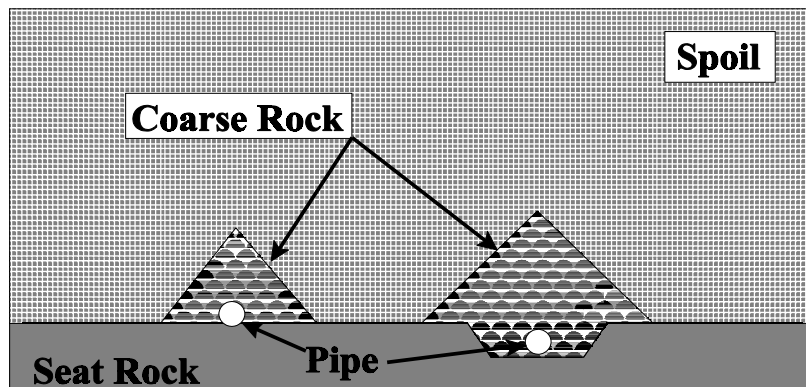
Cross Section of an Example Chimney Drain
